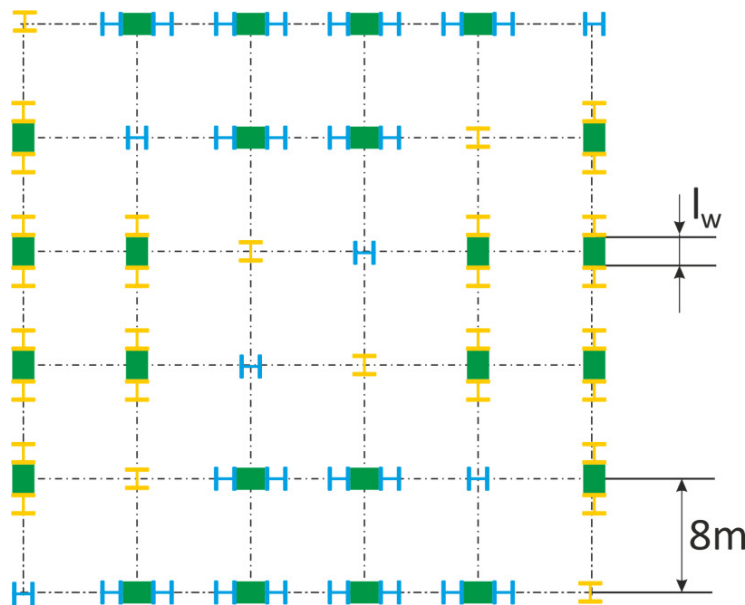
TOP VIEW OF THE STRUCTURAL SYSTEM (PROFILES AND WALLS NOT SCALED).
